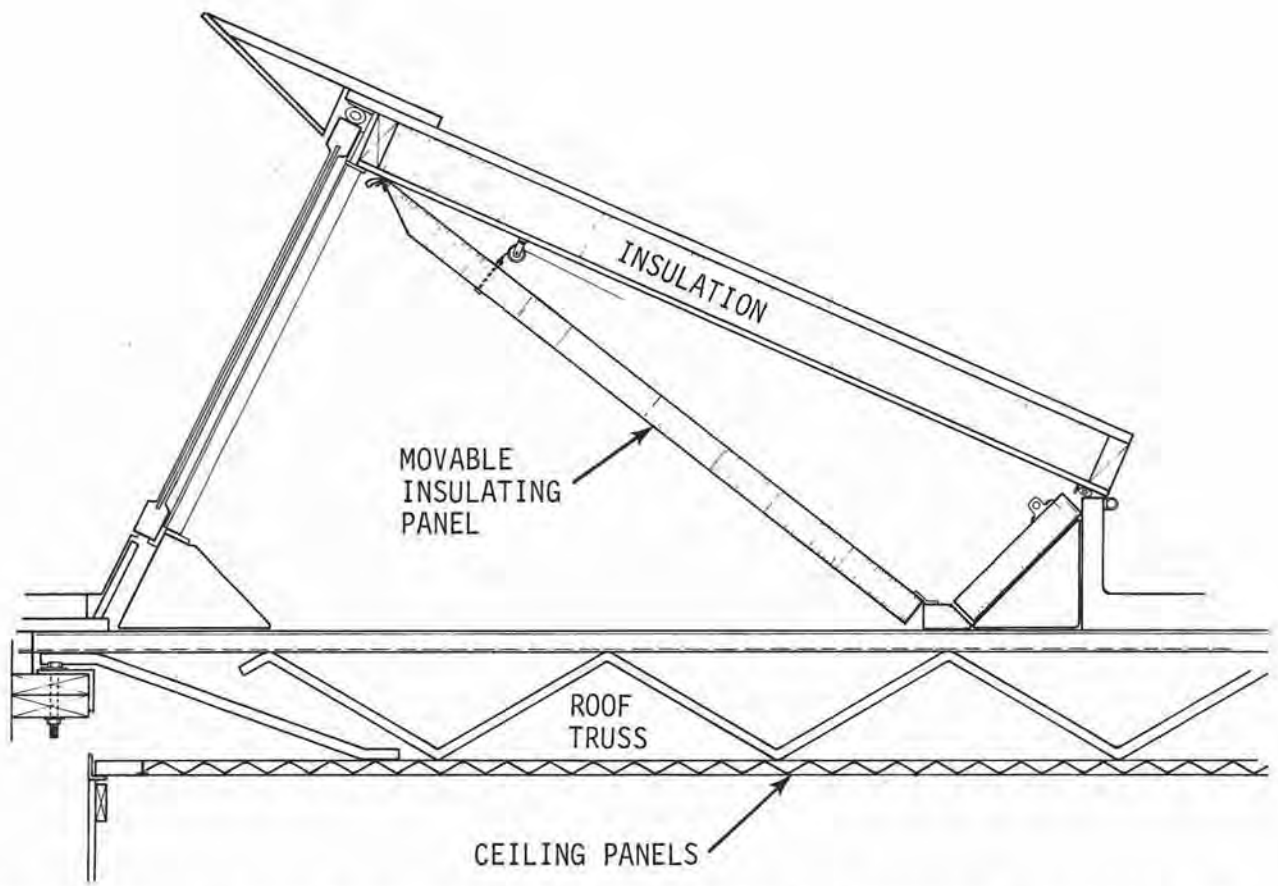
Cross-Sectional Drawing of Roof Aperture Construction
